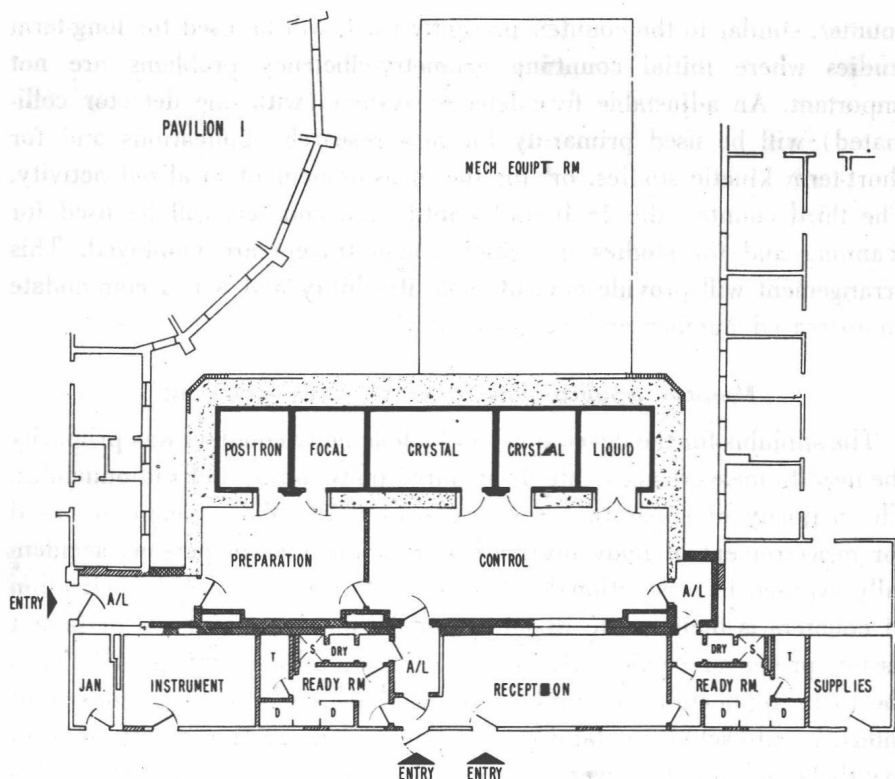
Proposed plan for Brookhaven low-level counting facility.
